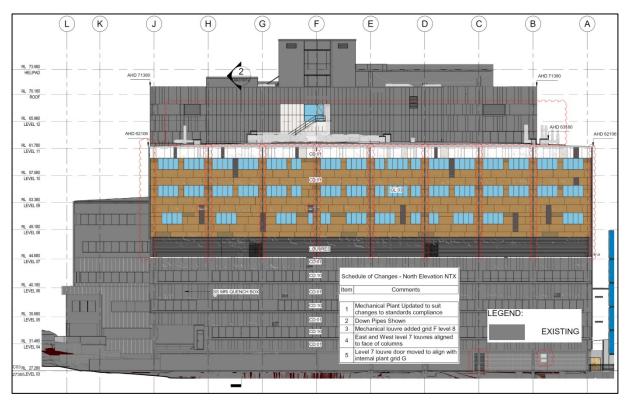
| SSD-8963-Mod-1 Proposed north elevation (Base source: SSD-8963-Mod-1)
